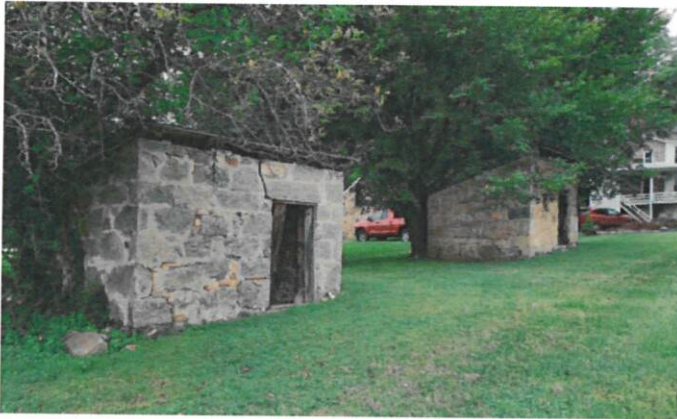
Historic outbuildings facing Knoll Glen Drive to be relocated. Currently located on proposed Lot 3.
